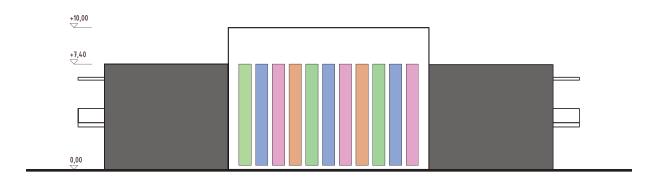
FACADE TOWARDS SOUTH, SCALE 1:250.
